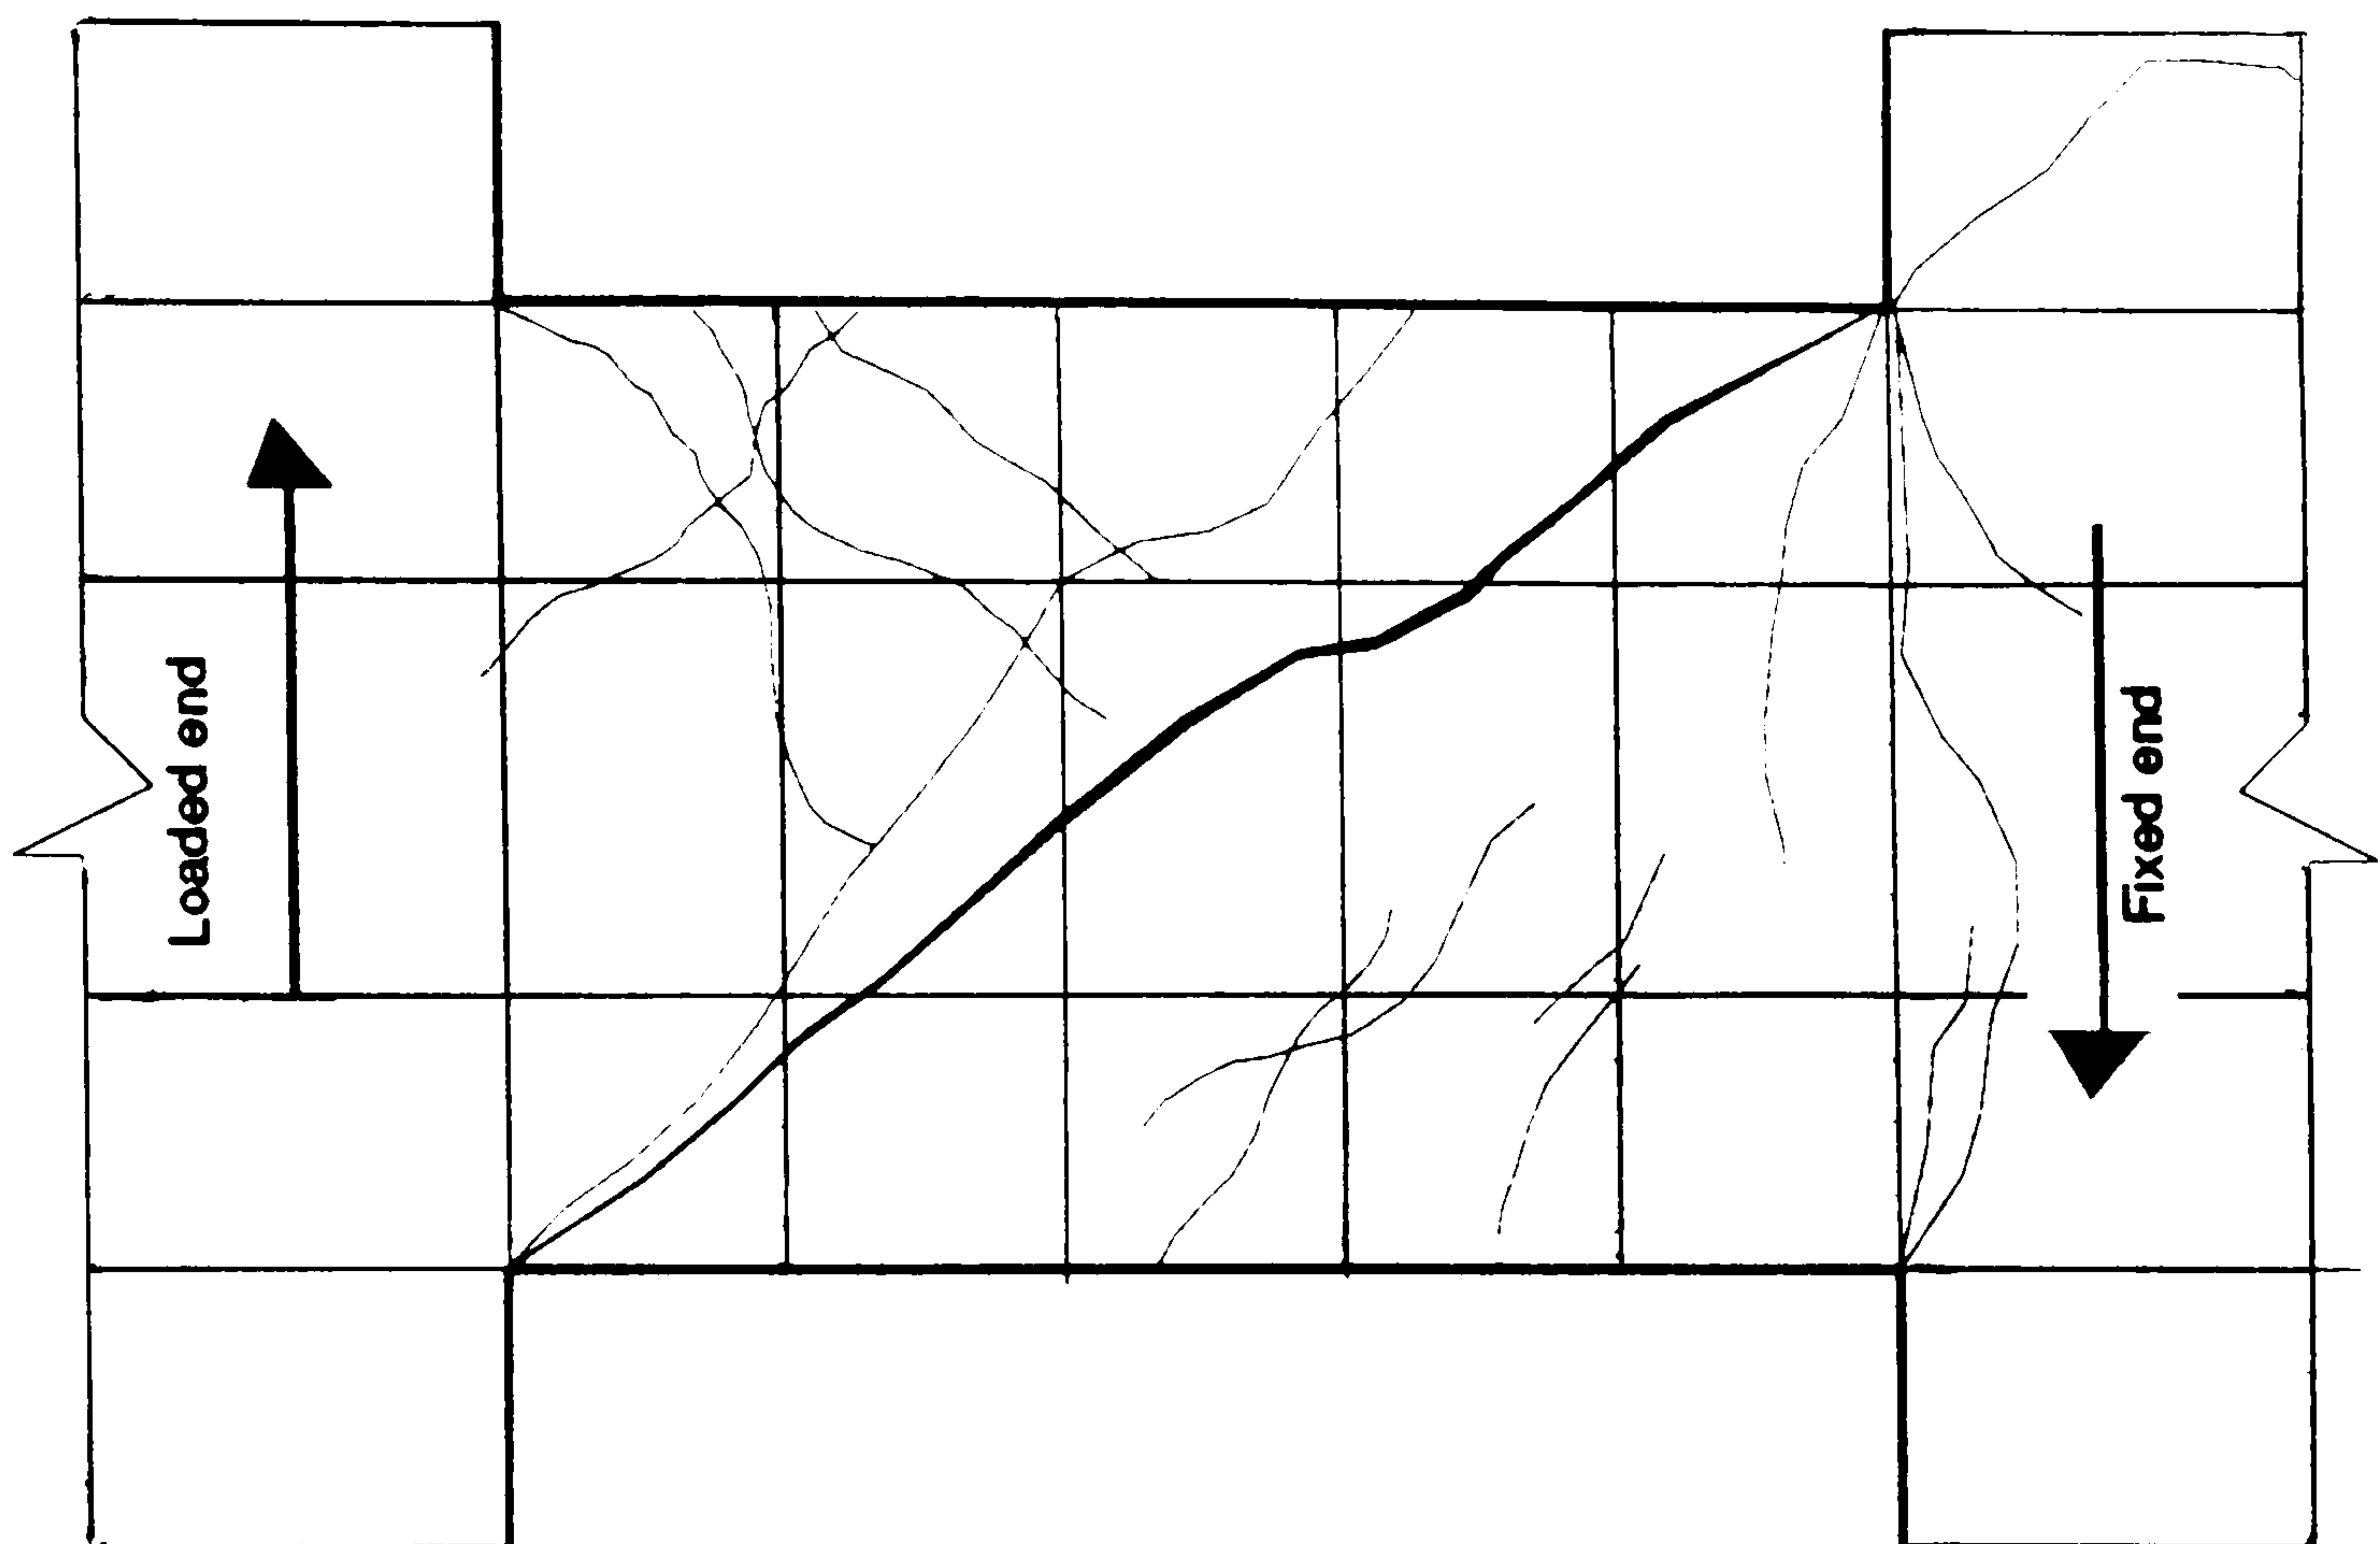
Failure mechanism and crack pattern for beam EBM2
